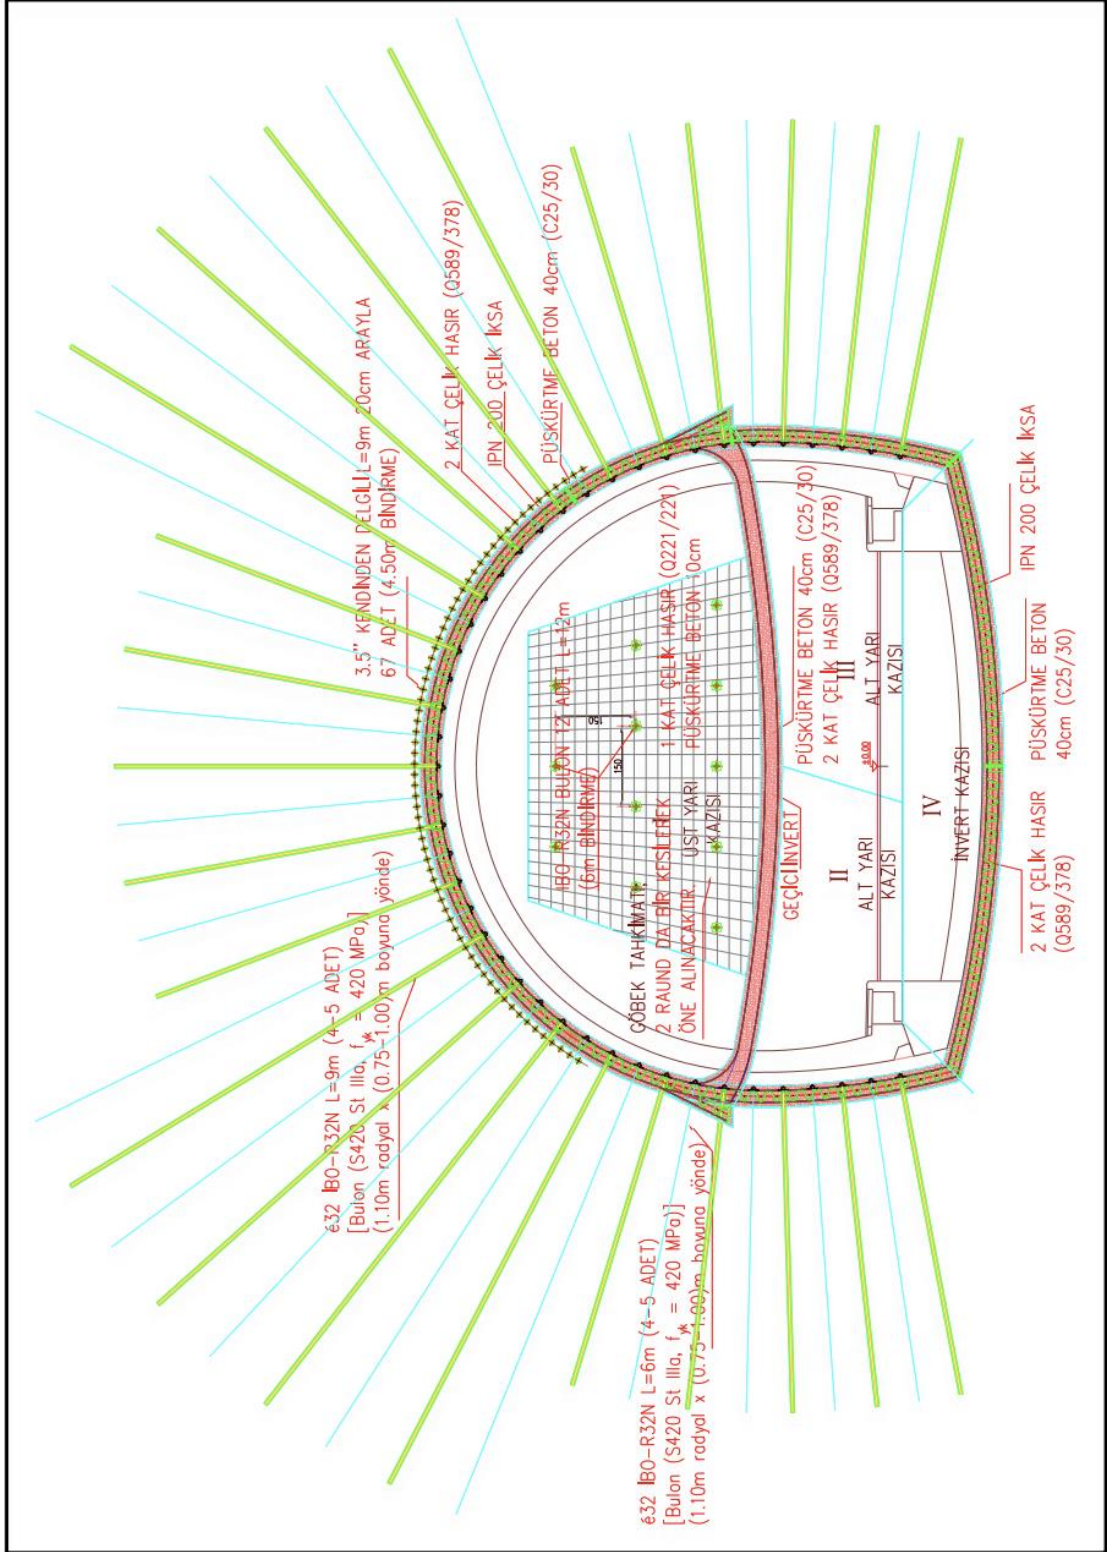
Tunnel excavation and support in a typical cross-section.
